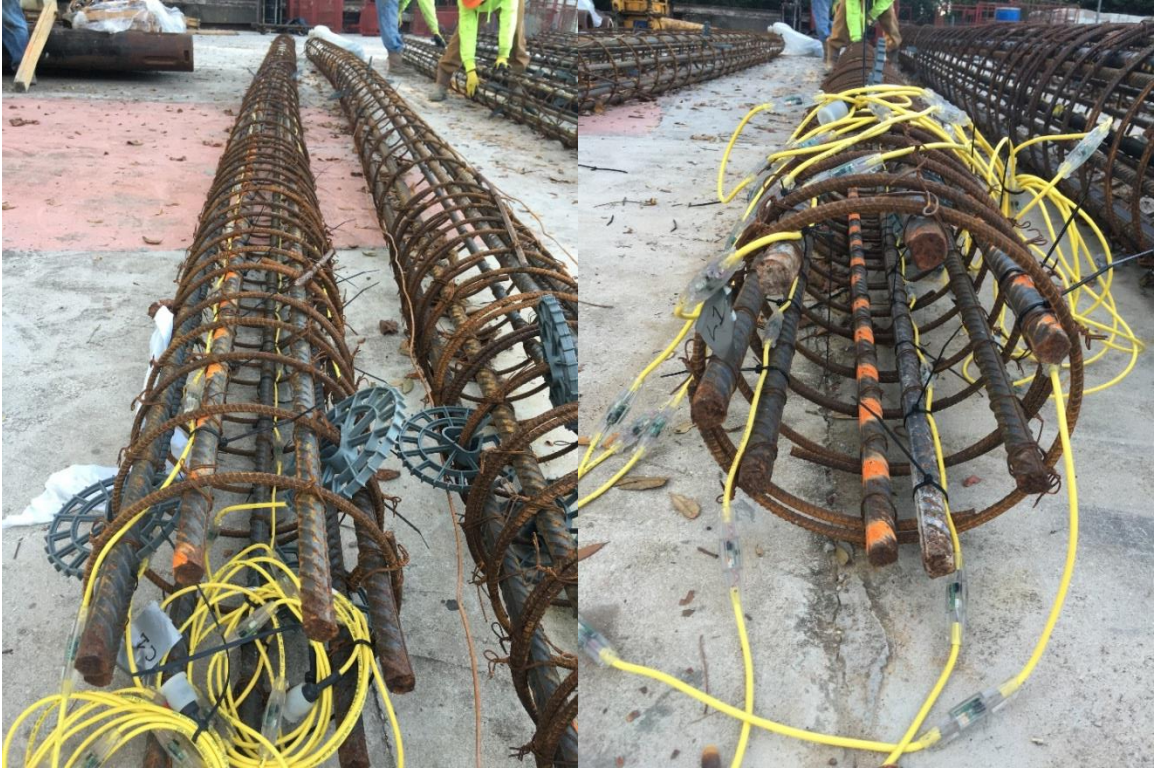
Top end of piles C1 (left) and L1 (right) reinforcement cages instrumented with thermal wires.
